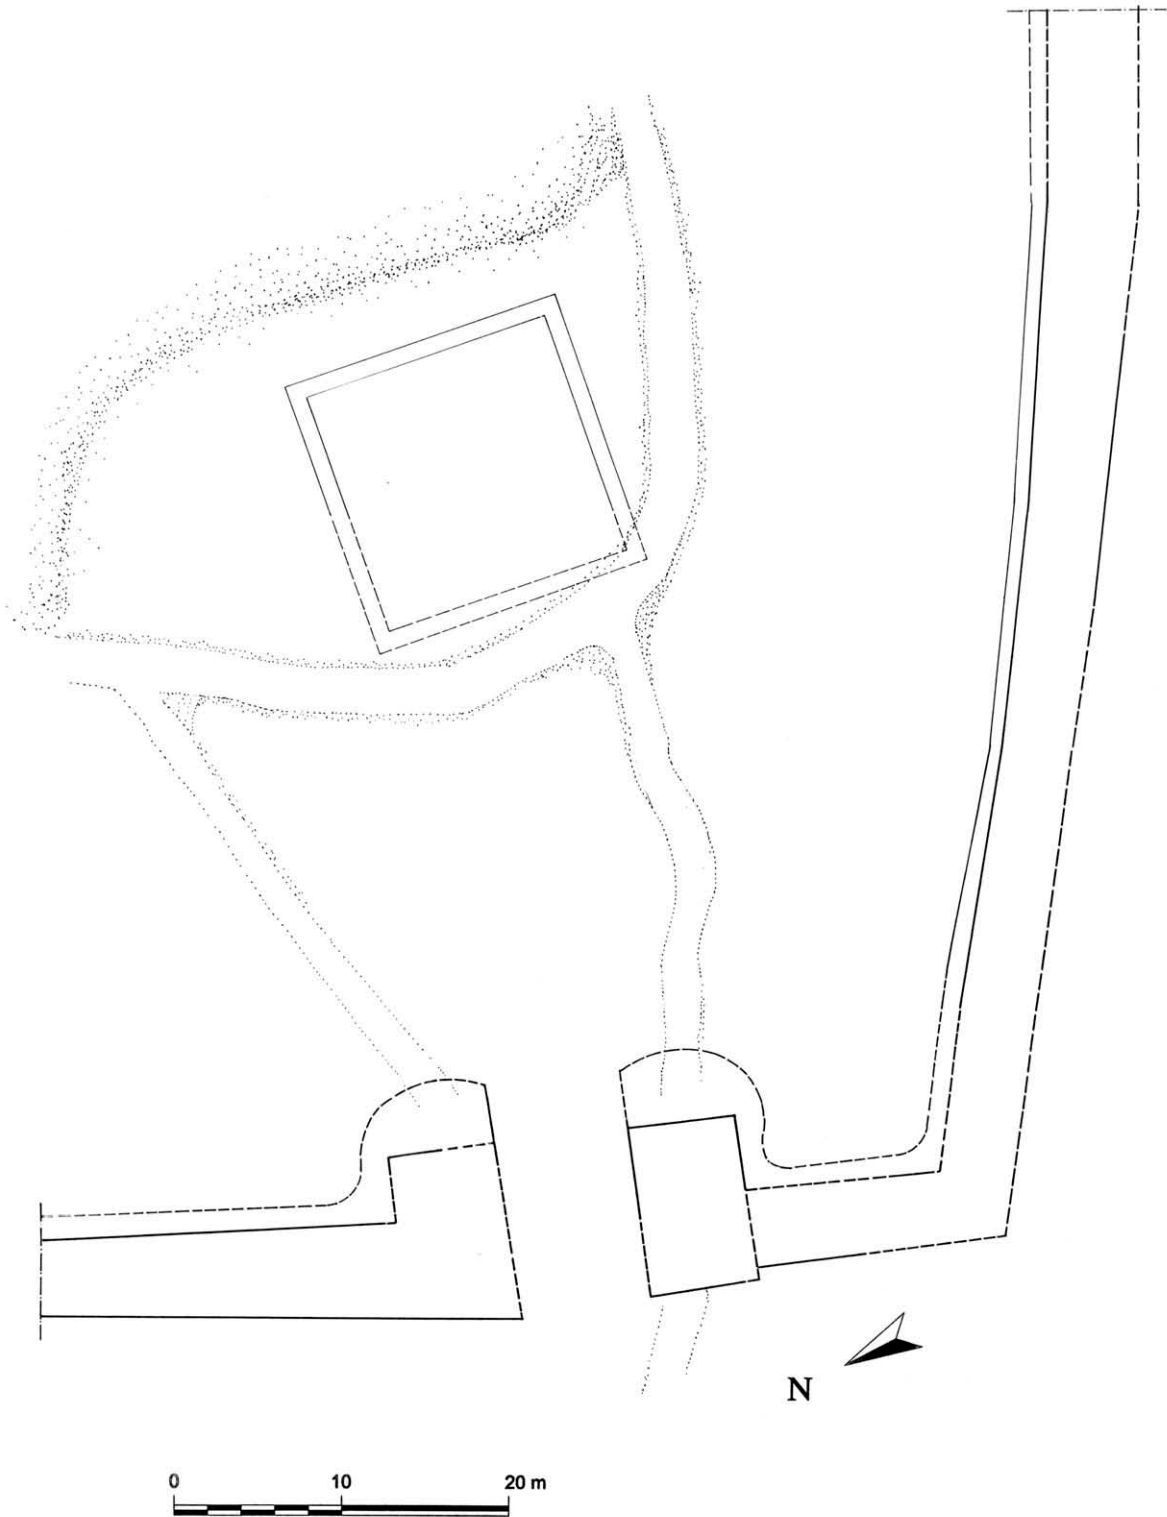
Plan of the newly discovered gate at the NE angle in the city wall, showing the extra mural structure and the lines of the modern tractor tracks that run over the towers. The gate passage, some 8m wide, is filled with stone fallen from the towers.
